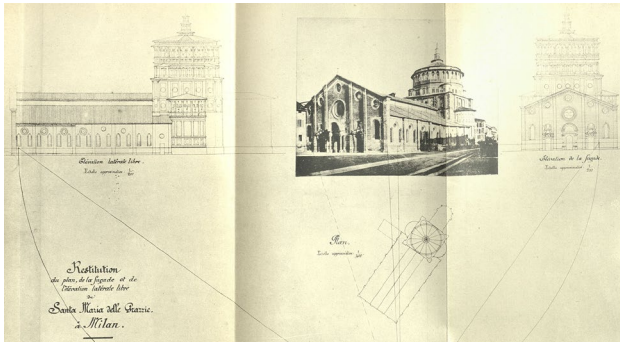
A. Laussedat, Reconstruction from a photo of the plan and fronts of Santa Maria delle Grazie church in Milan (Laussedat, 1899, planche 1).
